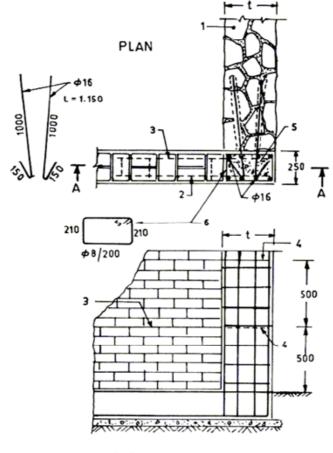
Connection Of New And Old Brick Walls (T-Junction)
